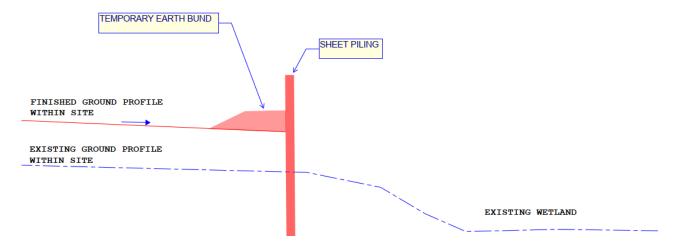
Sheet Piling at North-Eastern Corner, with Earth Bund
